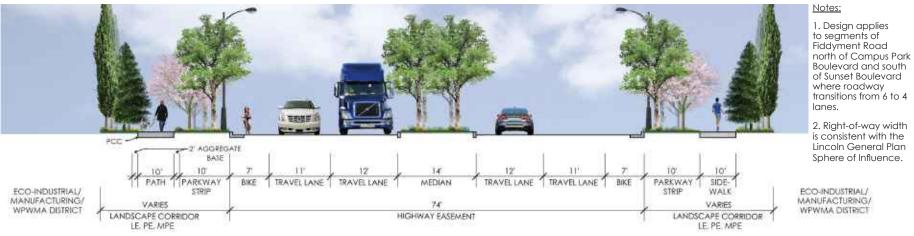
Fiddyment Road - Section B, 4-Lane Arterial, North of Placer Parkway adjacent to Eco-Industrial/Manufacturing/WPWMA District LE = landscape easement, PE = pedestrian easement, MPE = multi-purpose easement
